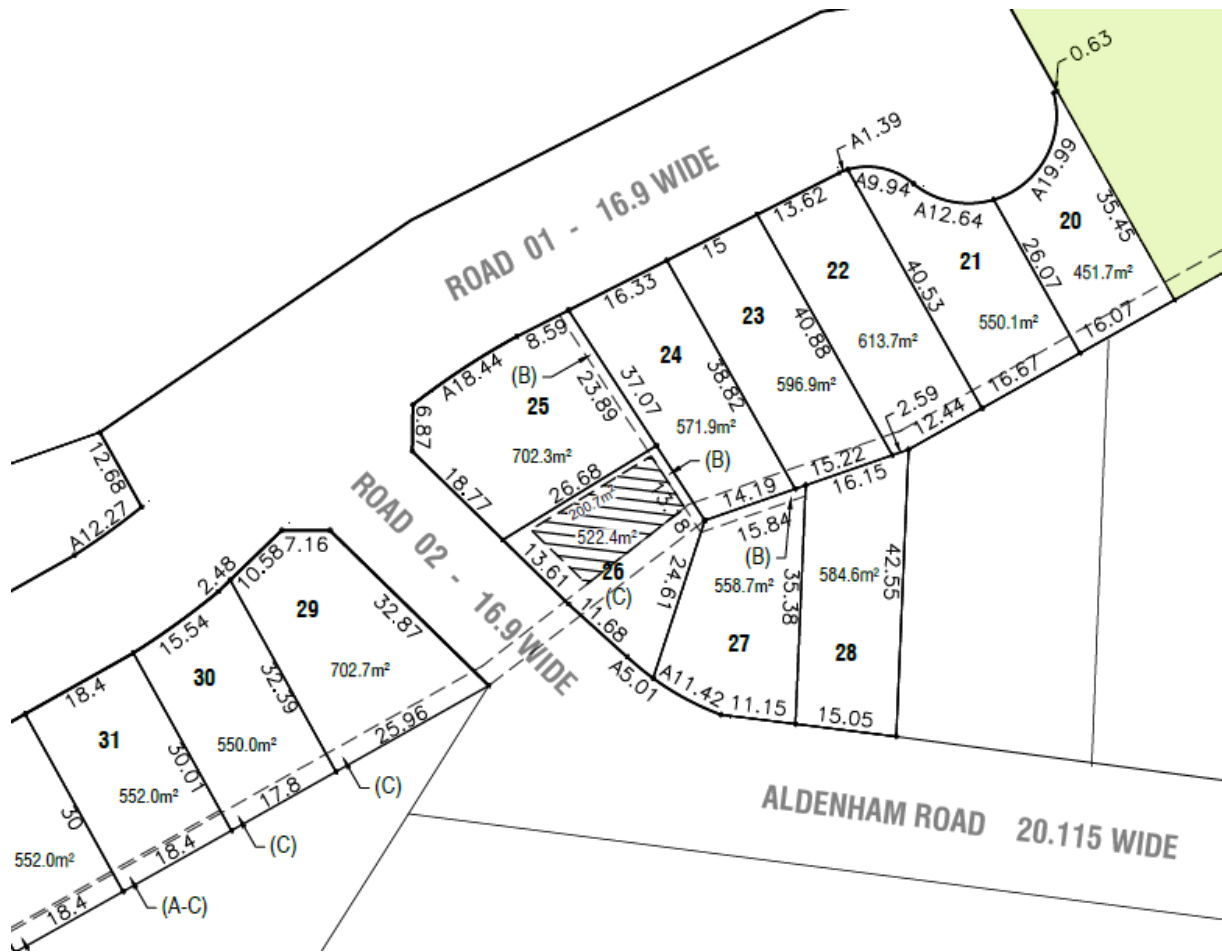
Proposed Subdivision Plan – Revision F – Lot 26 adjusted Sewer Easement Location and Building Envelope
